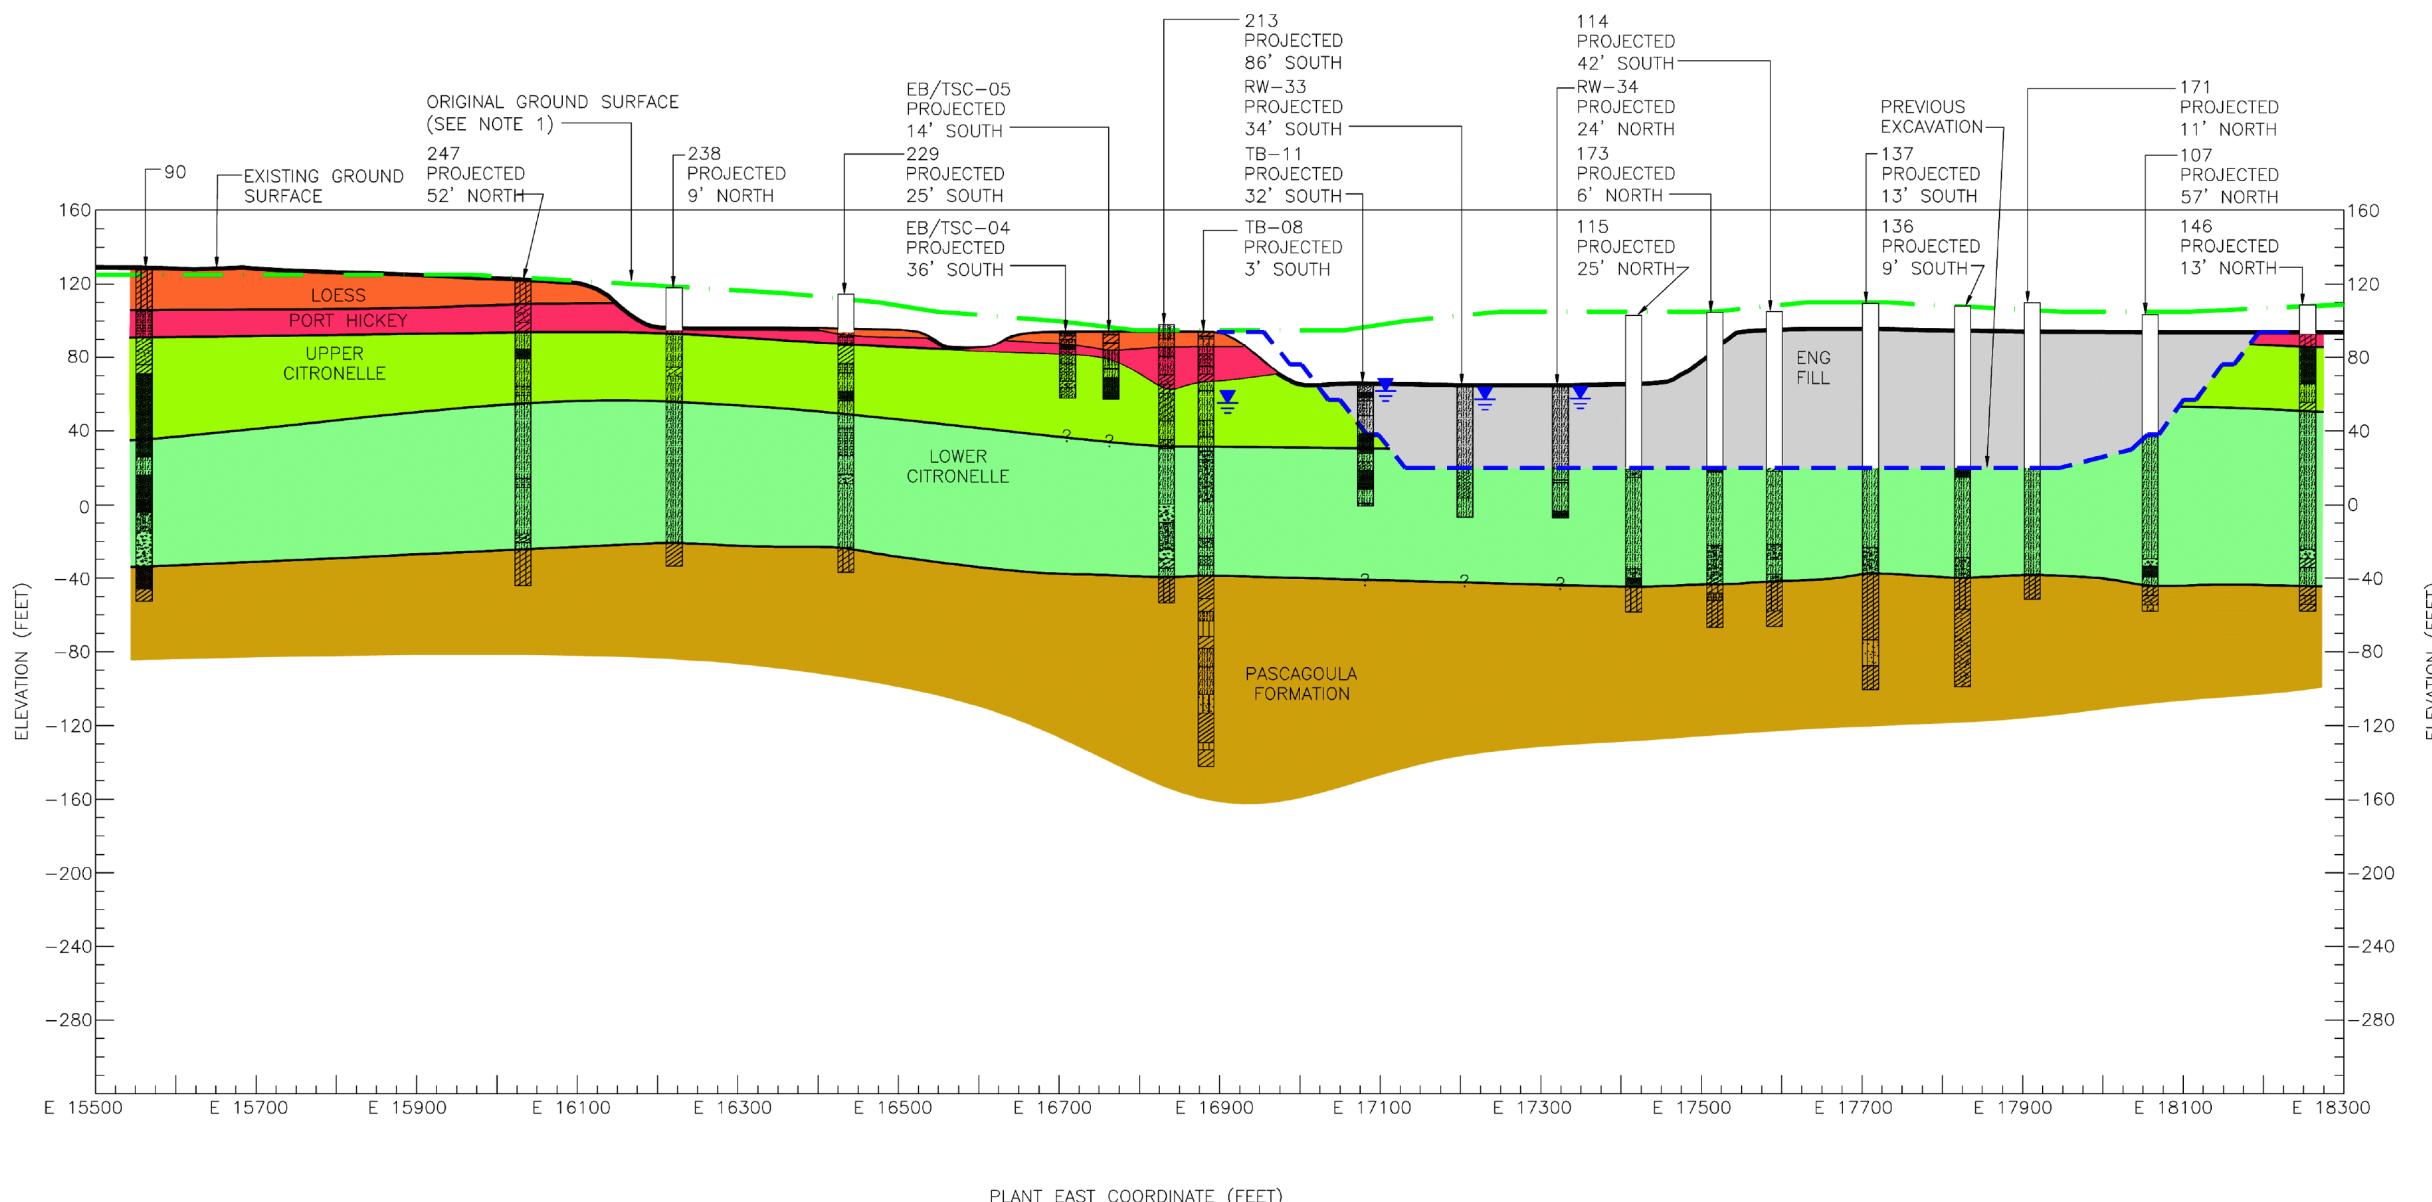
Southwest-Northeast Cross Section through Unit 3 Site Location
